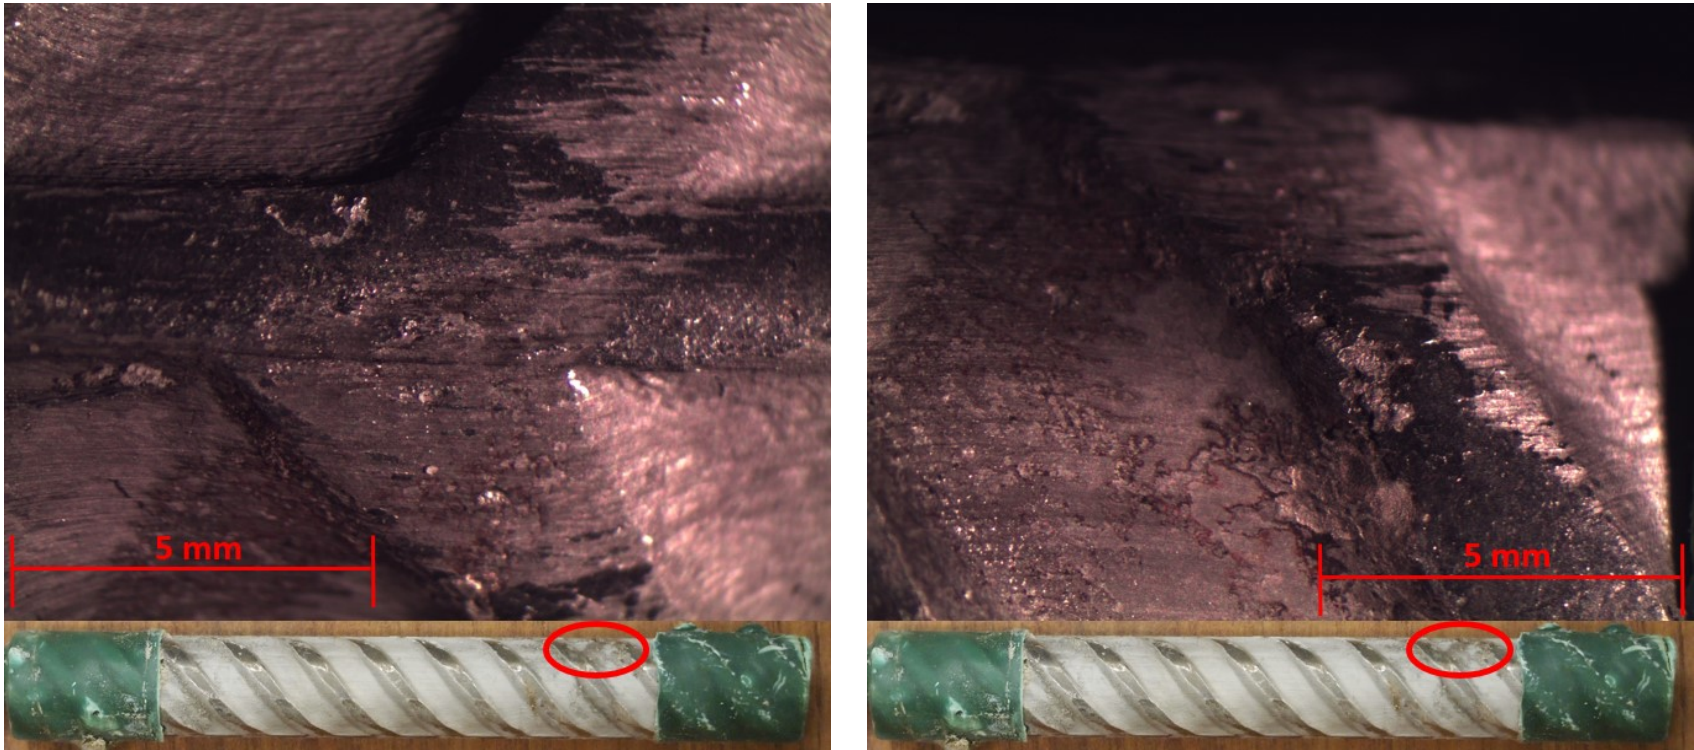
RST 7.5-400 Batch – XM-28 AR 8.6 Corrosion Products causing Cracking of Concrete Specimen
